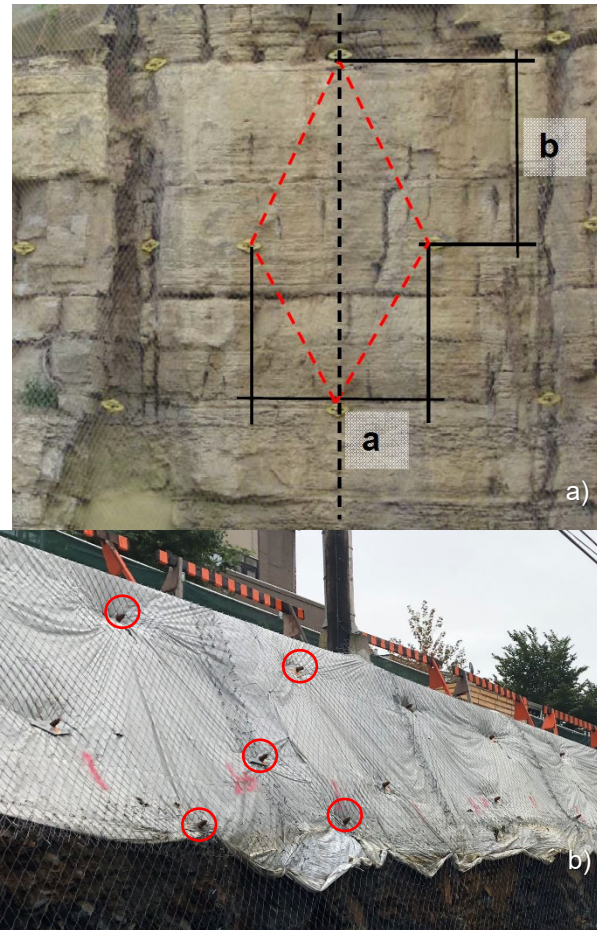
General profile with the nail arrangement showing offset and distance between nails a and b (a) and staggered pattern of nail installations at Brenton Building Excavation (b).
